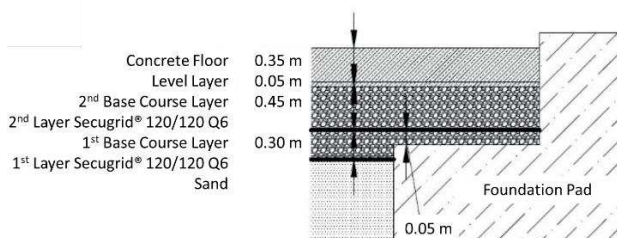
The two-layer, biaxial geogrid in the area of a reinforced concrete foundation (Dr Beuße).
